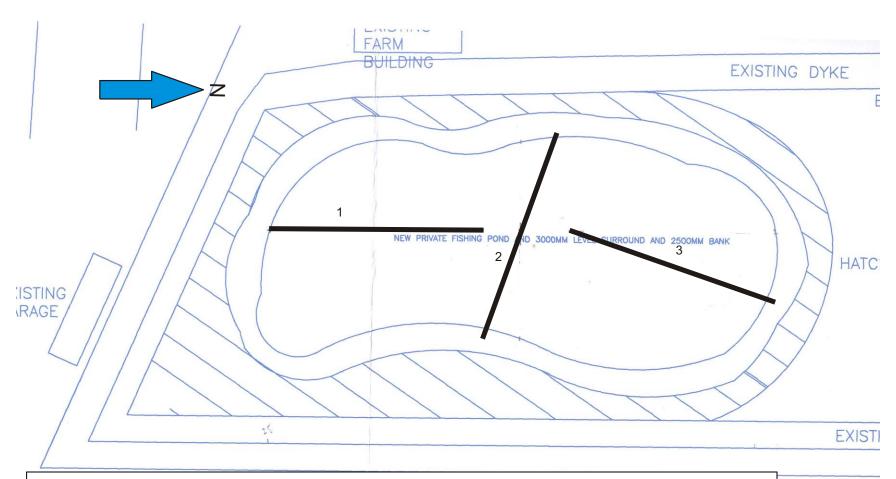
Plan of the proposed and final layout of trial trenches, at an original scale of 1:500 (extract from Architects plan)
